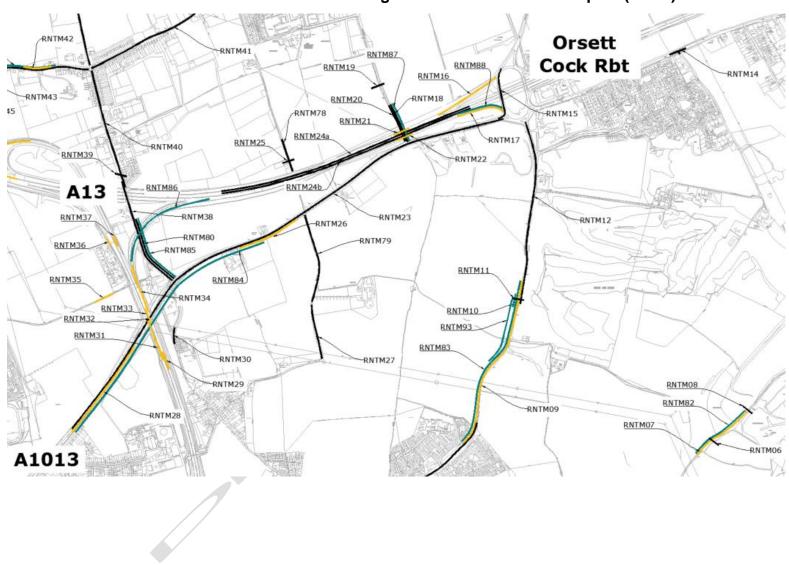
Roads North traffic management measures location plan (2 of 7)
